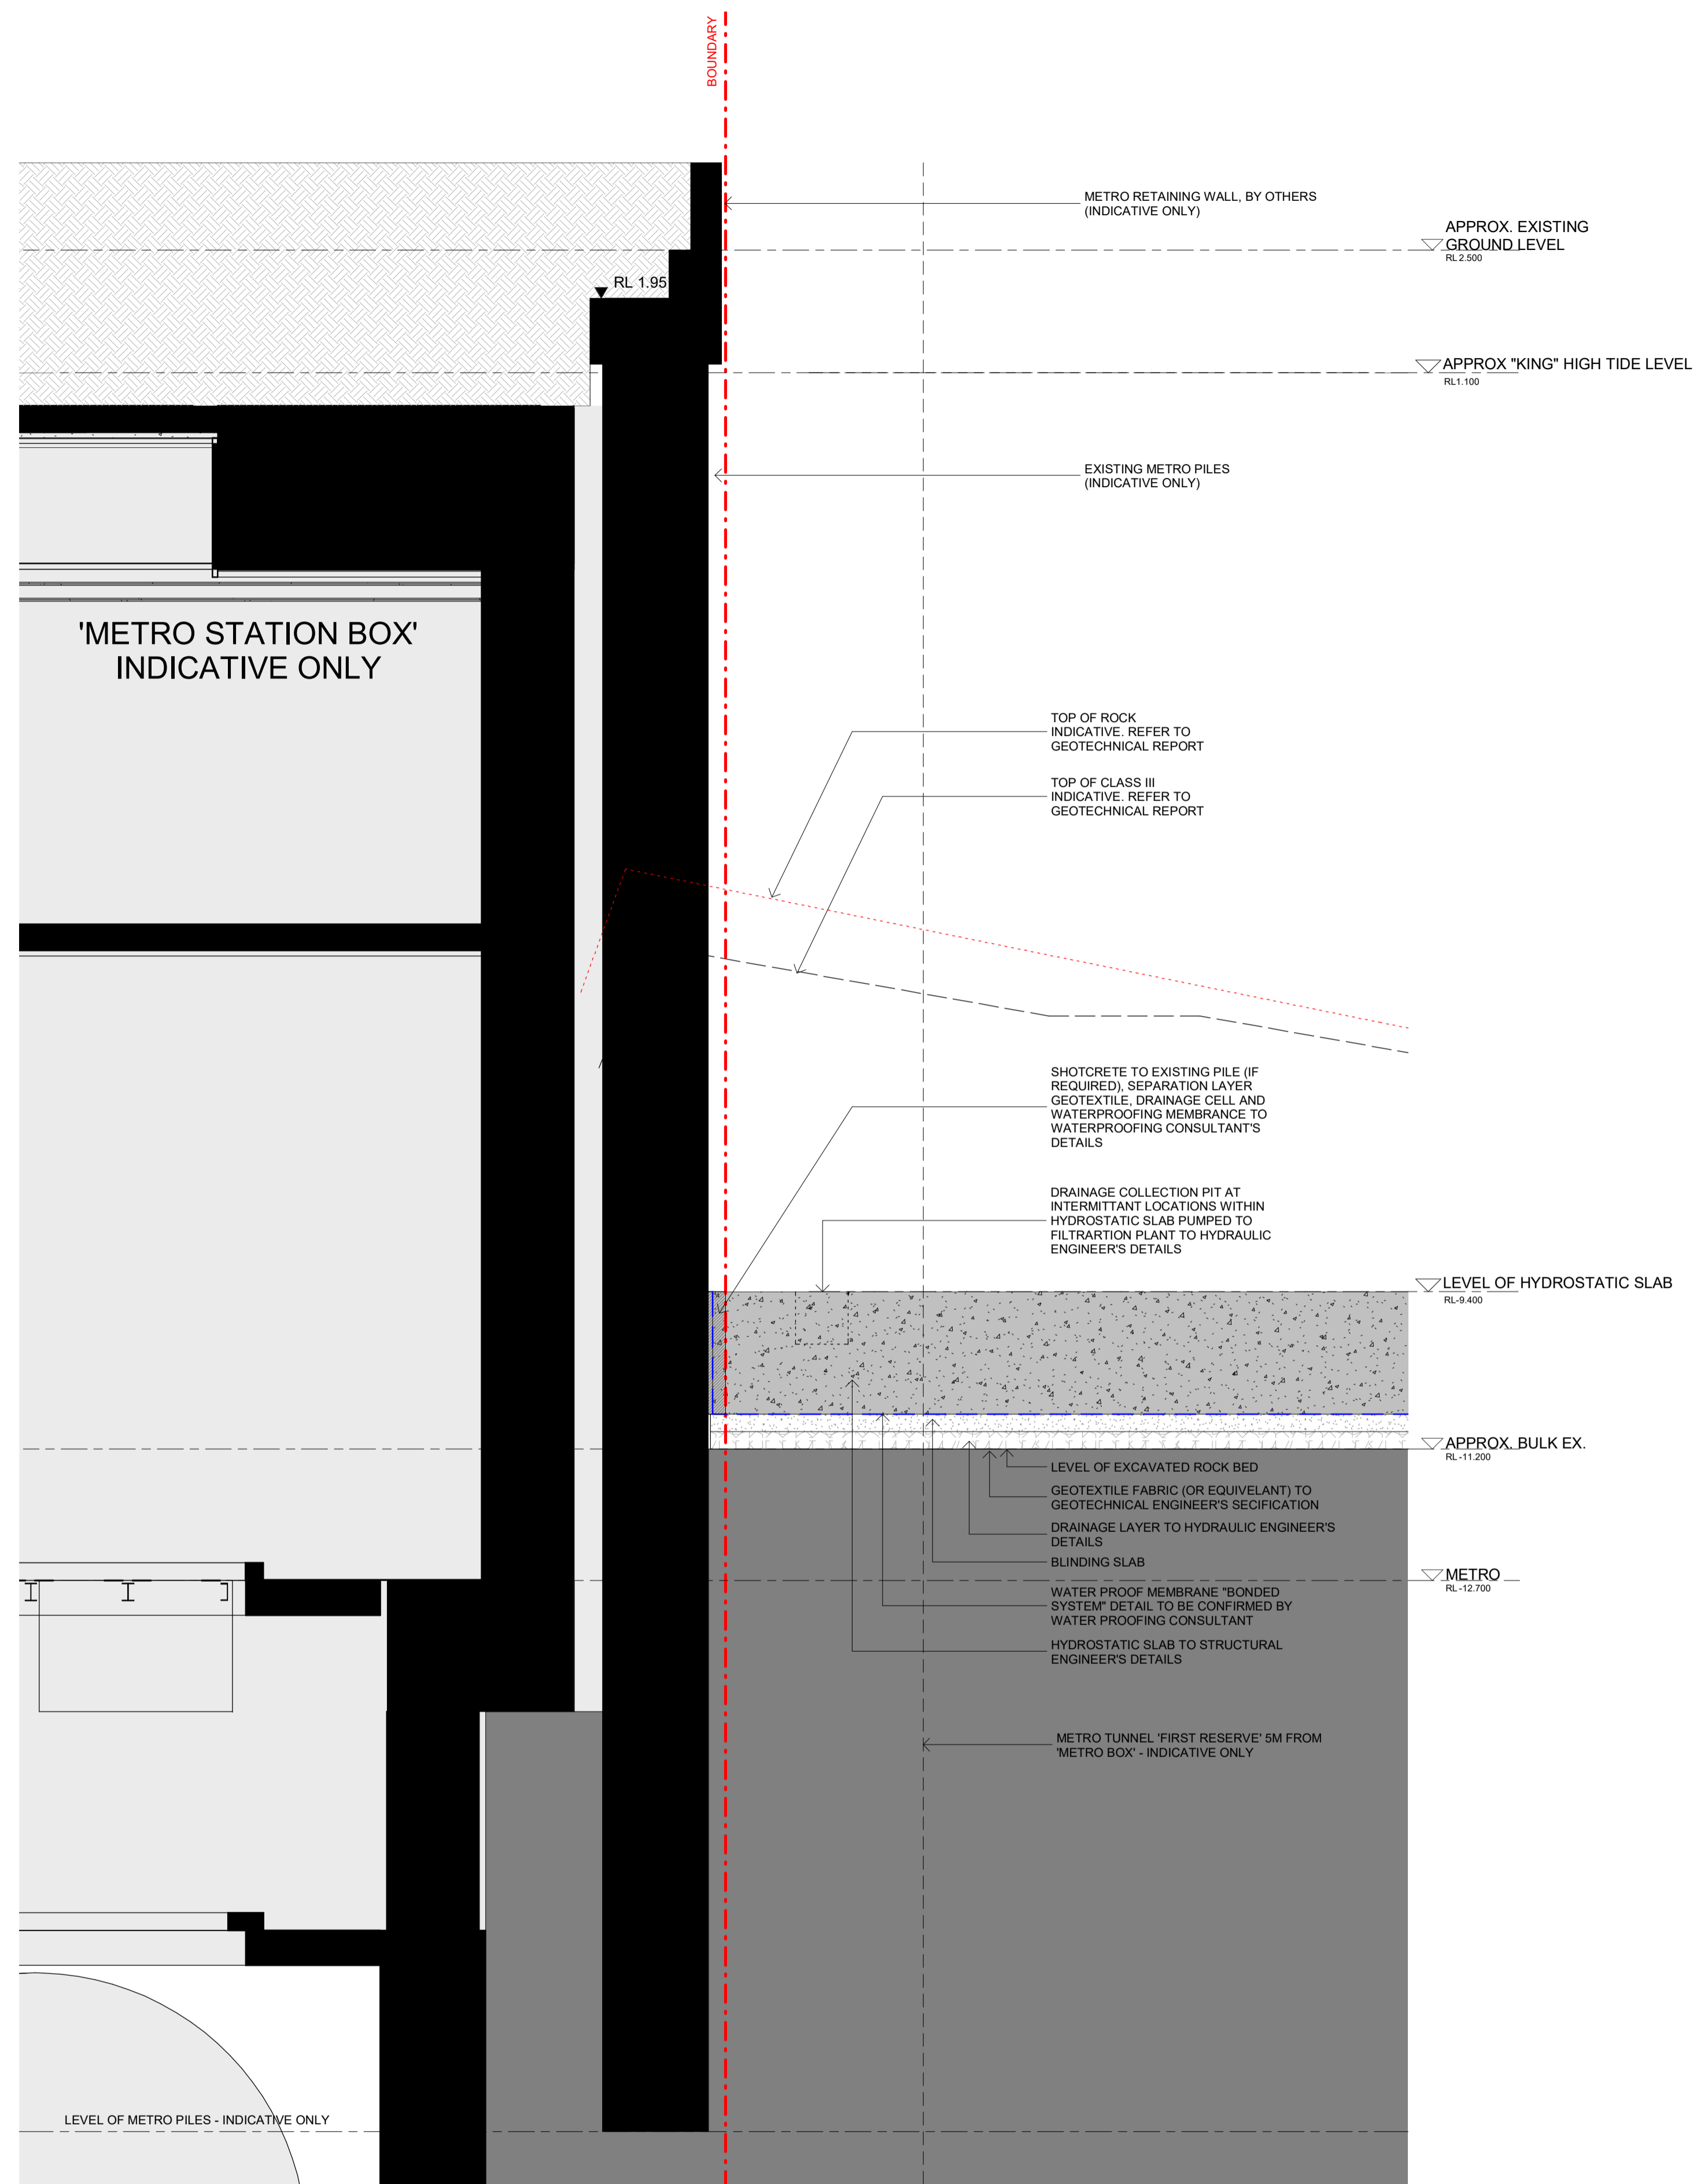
DETAIL WALL SECTIONS - SHEET 1 (NORTH)
